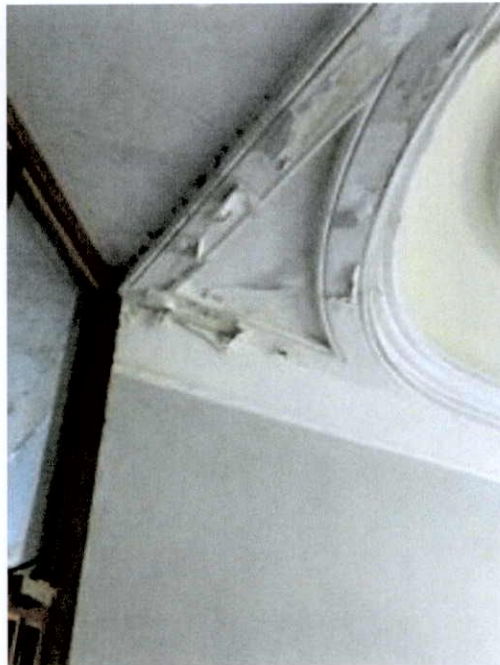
Flaking paint and staining of ceiling due to water ingress.
